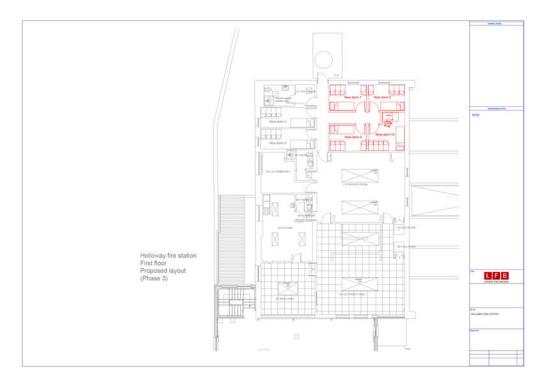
Holloway fire station, proposed layout on first floor (phase 3 of project)
